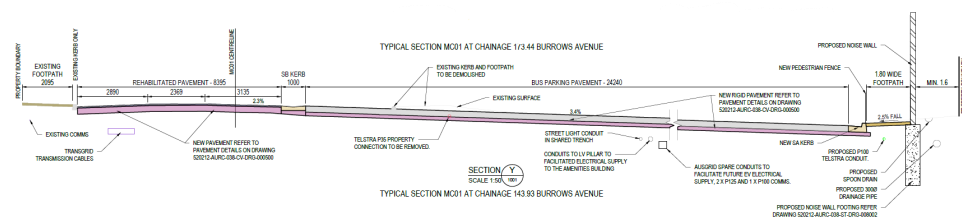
Typical cross-section at chainage 143 Burrows Avenue
